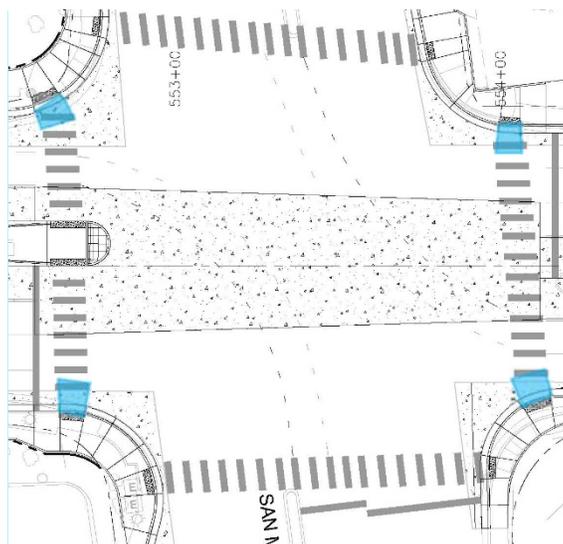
Reconfiguration of ramps and striping crossing Central Ave as part of change orders in construction plans
